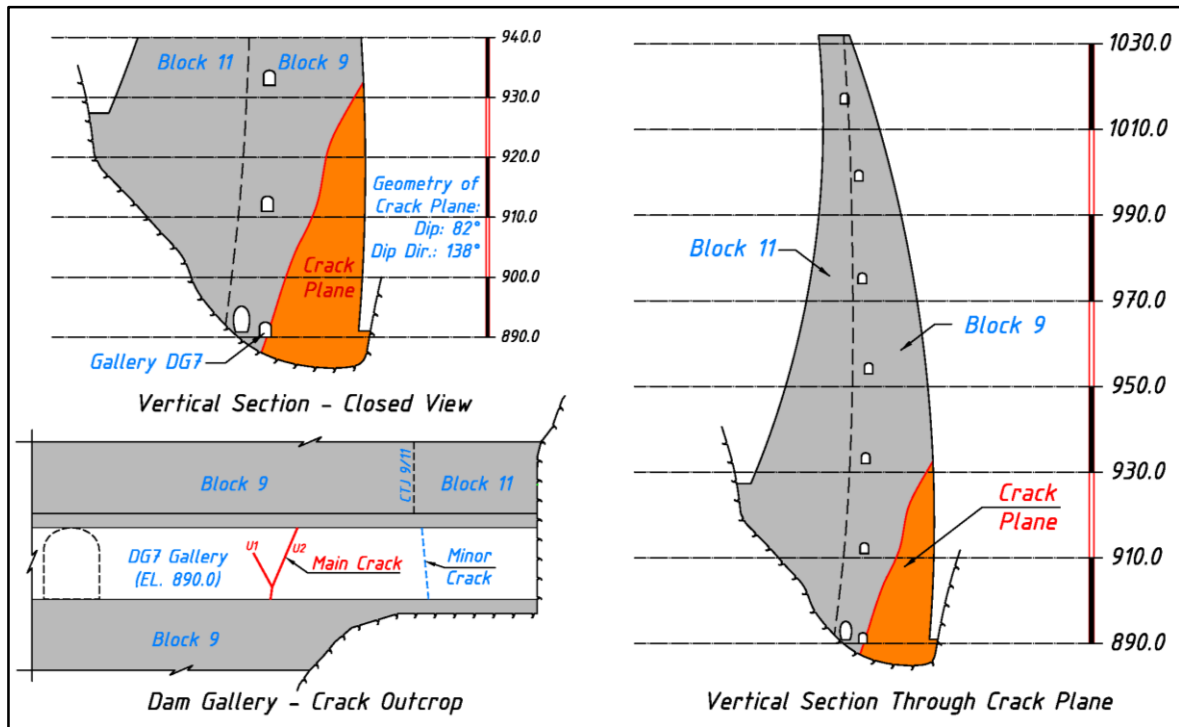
[4]. As indicated in Figure 1, the crack outcrop is visible in upstream wall and partially in roof and bench of the dam gallery DG7 at elevation 890 masl.
